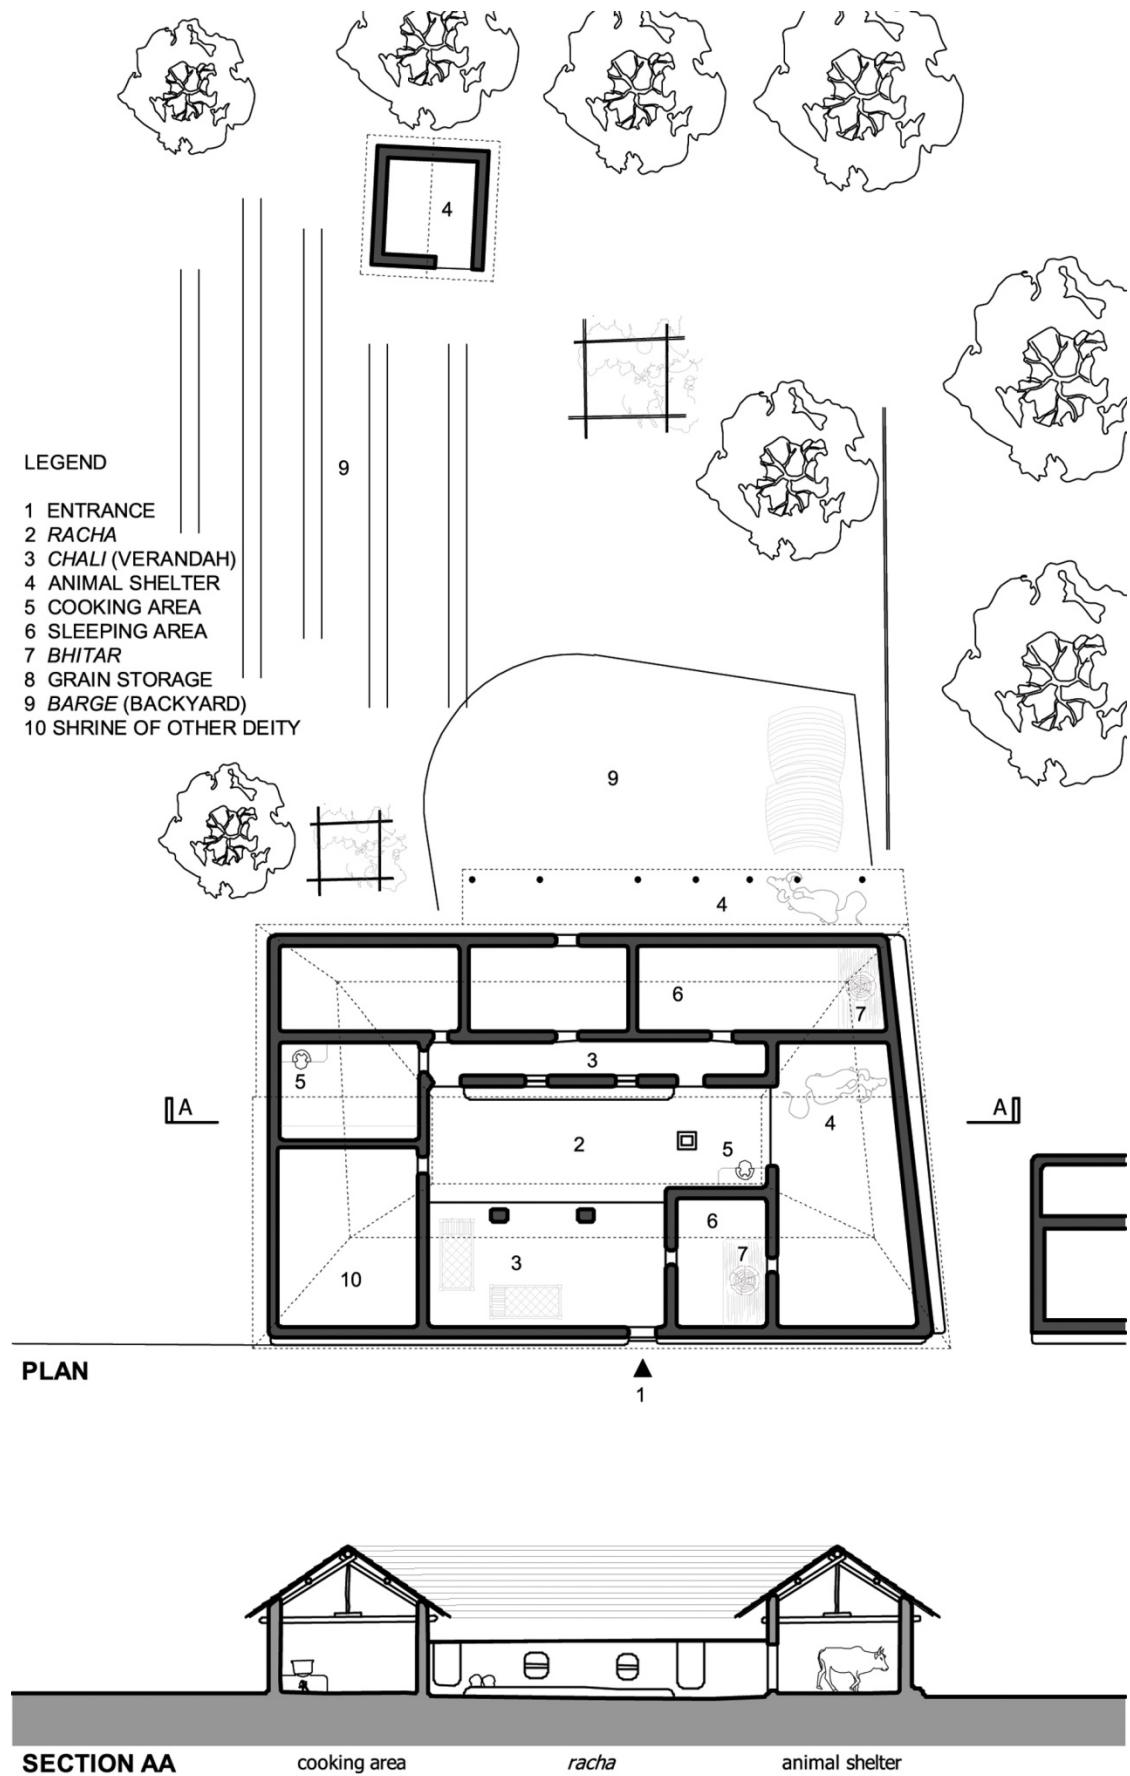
Layout of B. Hansdah's house in Bhagabandh
